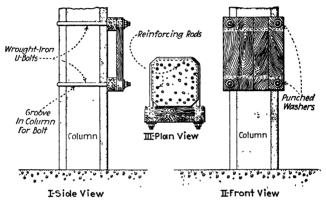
Structural-steel motor bracket for mounting on a concrete column.
